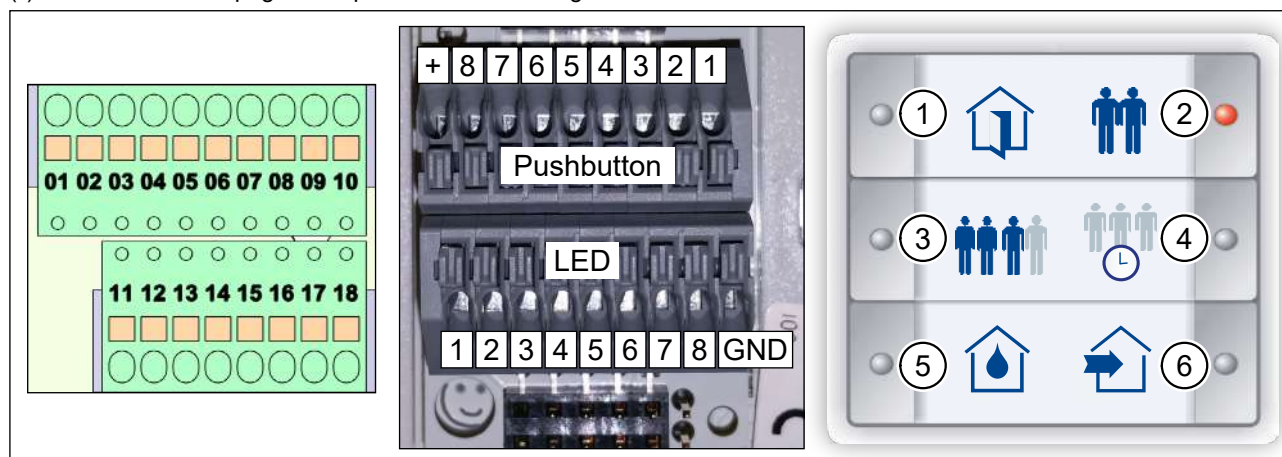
Terminal blocks on ventilation unit, terminal blocks on InControl pushbutton sensor, insert sheet
